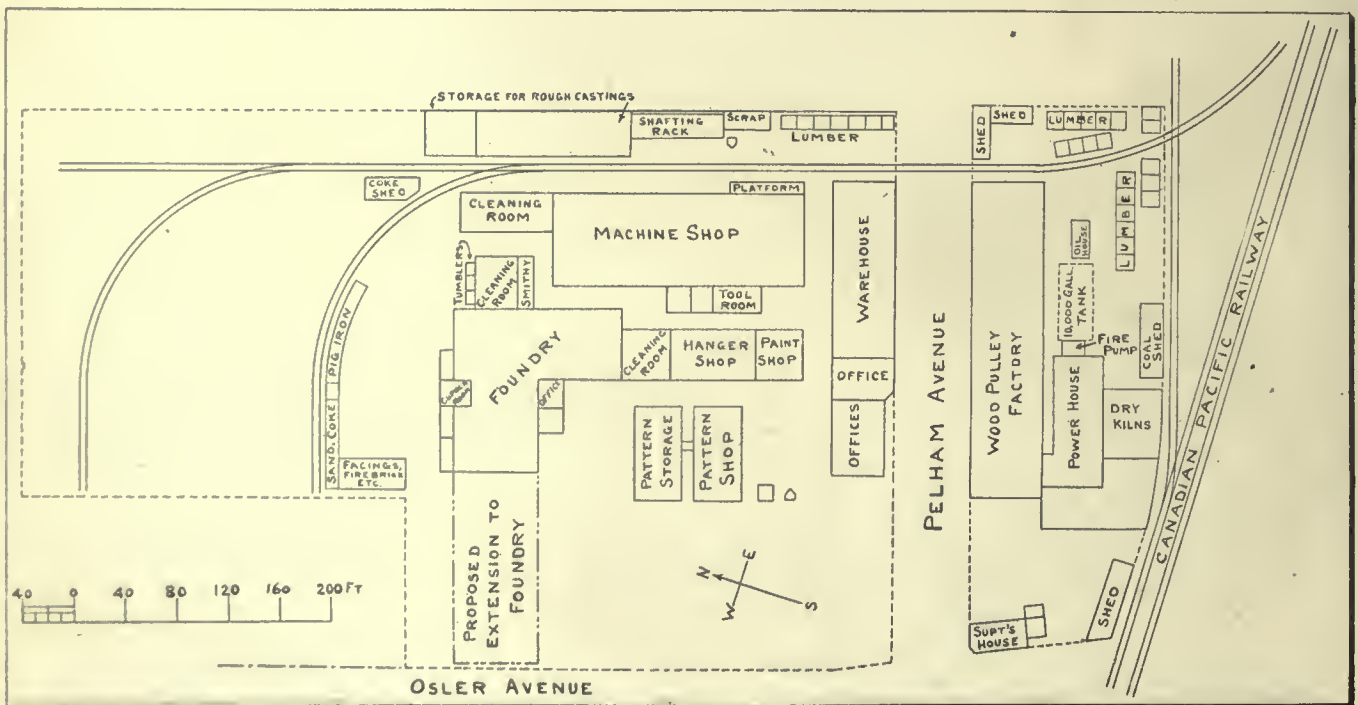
PLAN OF DODGE MANUFACTURING CO. WORKS.
